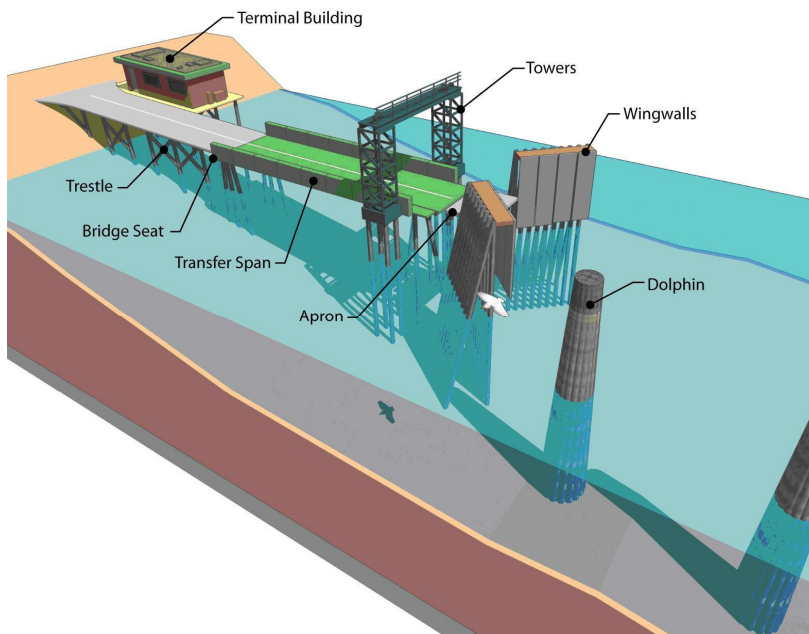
Typical Ferry Terminal Layout showing the Location of the Transfer Span
